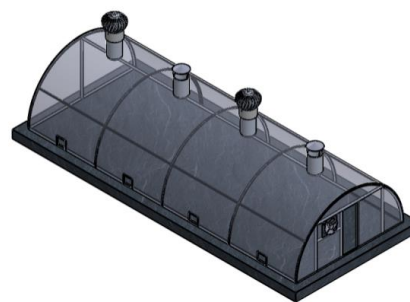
Walk-through type solar tunnel dryer with Cement-concrete base, transparent top, air inlets, hot air outlets, and provision of forced convection
